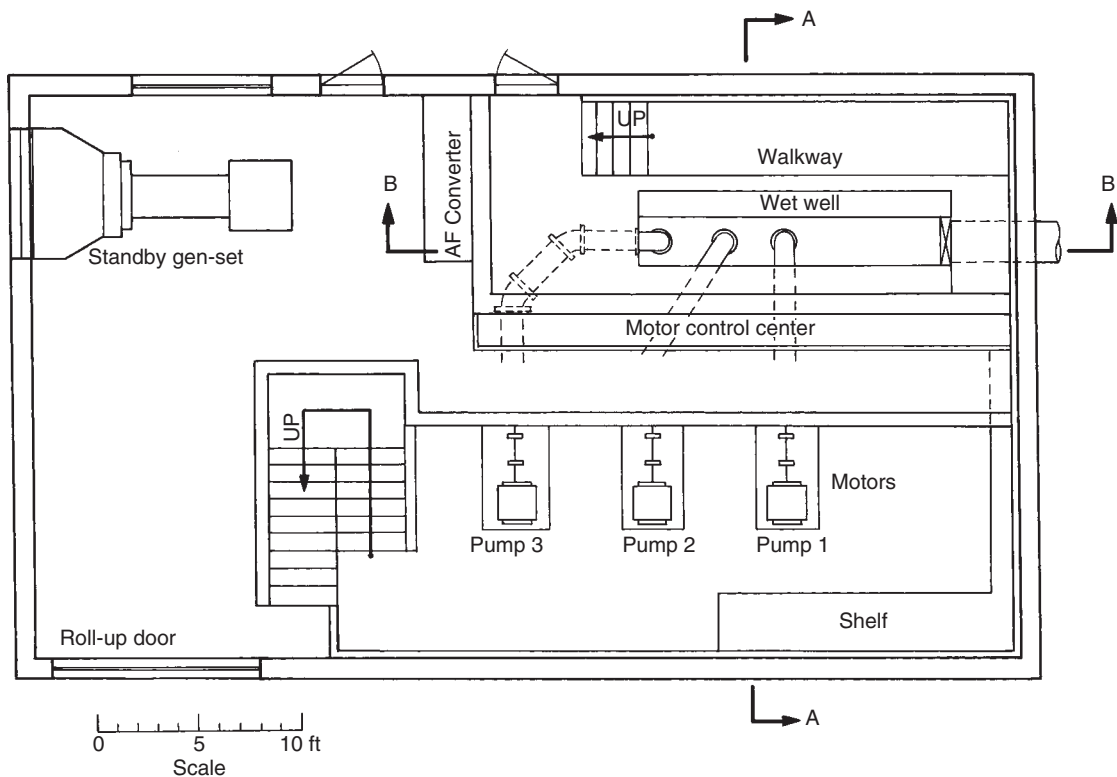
Ground floor plan. Revised Kirkland Pumping Station.
